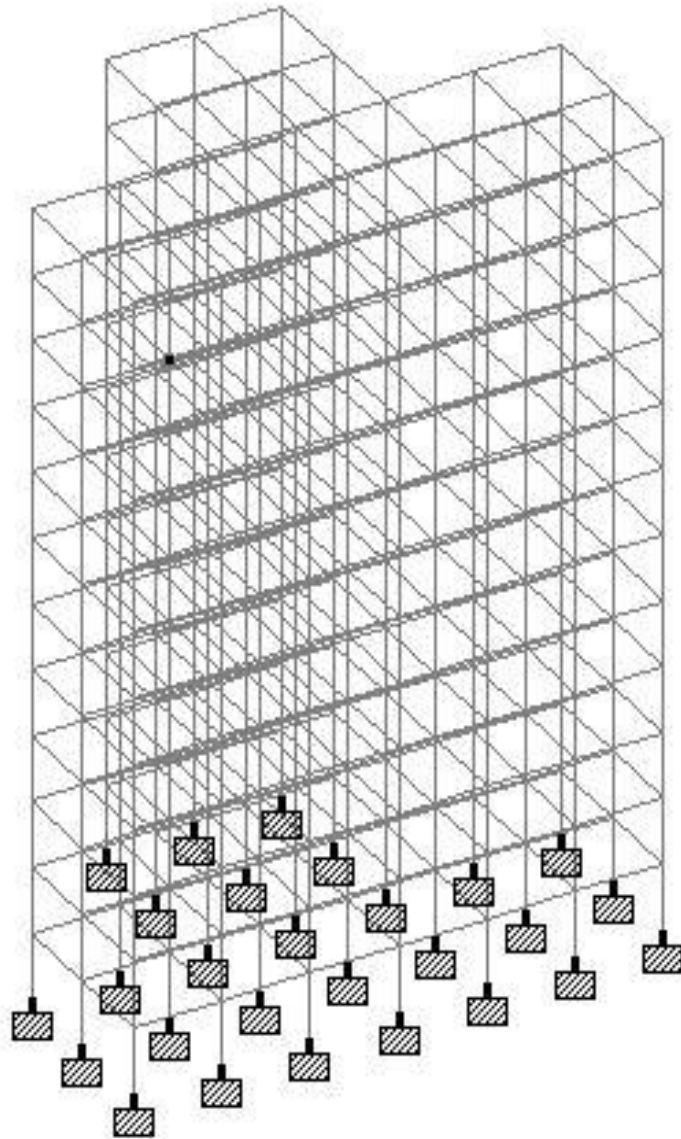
3D view of T shaped Re-entrant corner Structure(12 Storeys)
